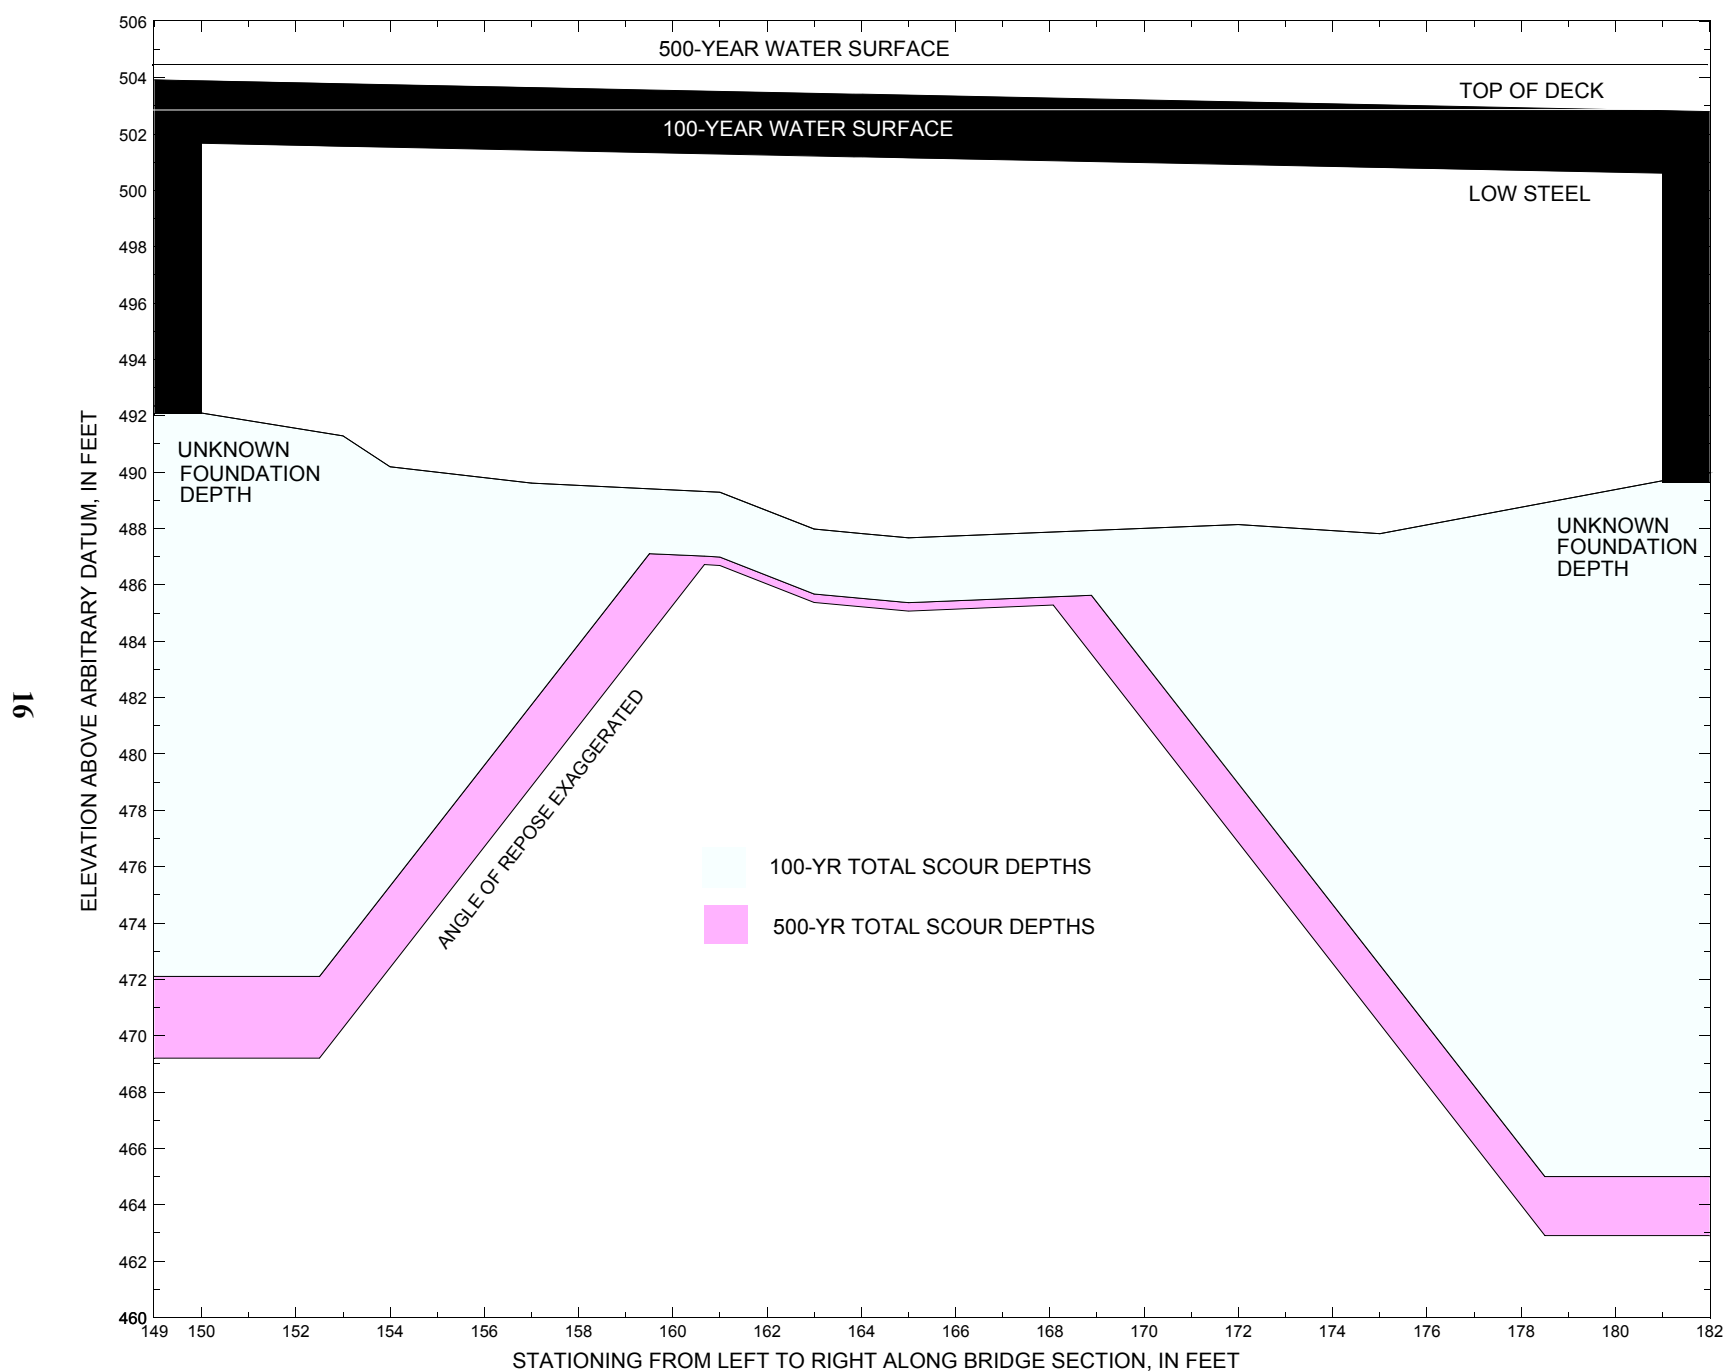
Scour elevations for the 100-yr and 500-yr discharges at structure [RANDTH00640038](#) on town highway 64, crossing [Second Branch of the White River, Randolph, Vermont](#).
